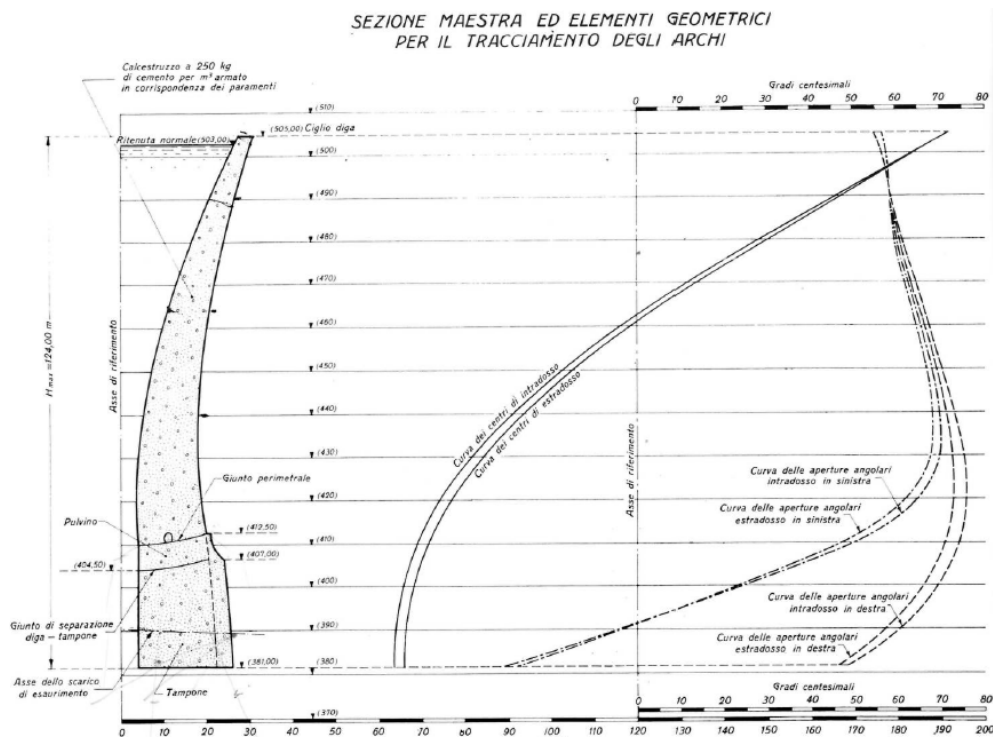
Master section and geometric elements for tracing the arches.
